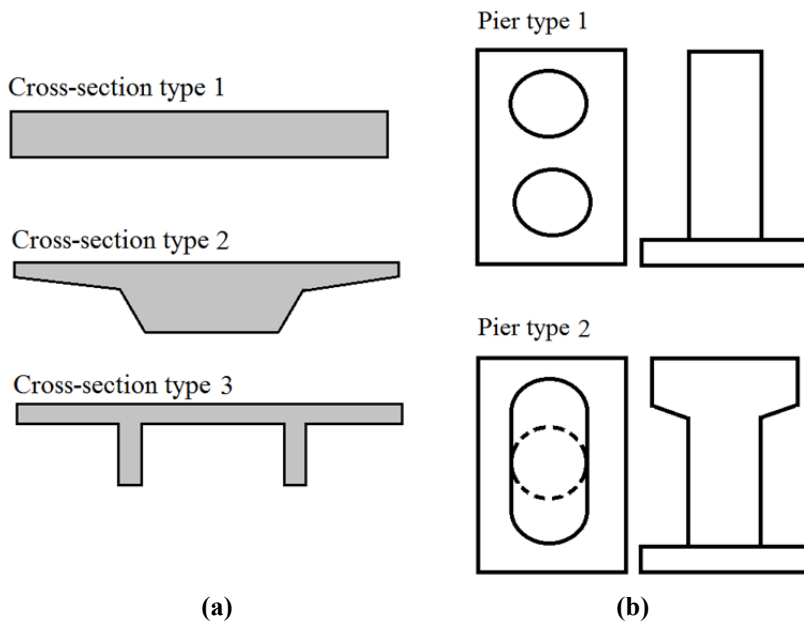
(a) Possible cross-section shapes for the bridge deck and (b) Possible pier types.
